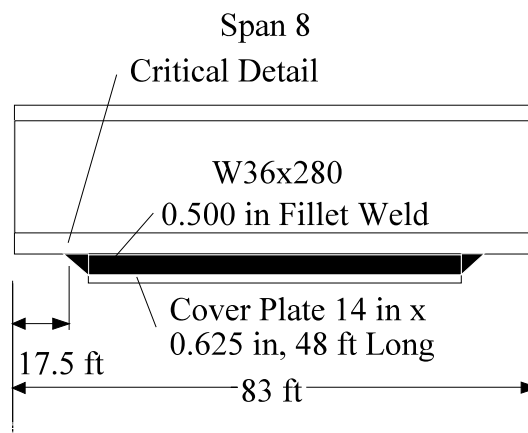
Welded Cover Plate Girder, Detail No. 5
